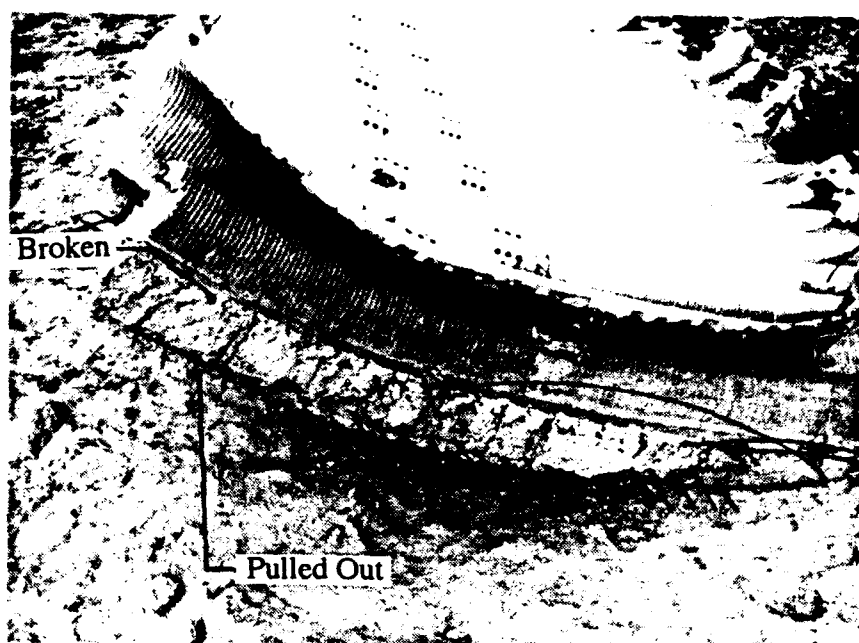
Broken reinforcing bars in transverse failure plane, PAS-4.
